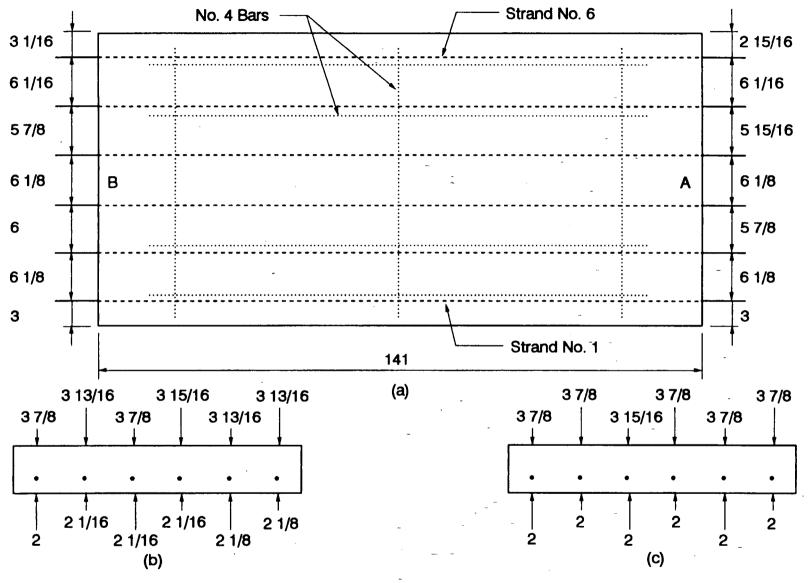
Specimen No. 8-6.0DC-1 (dimensions shown in inches):
